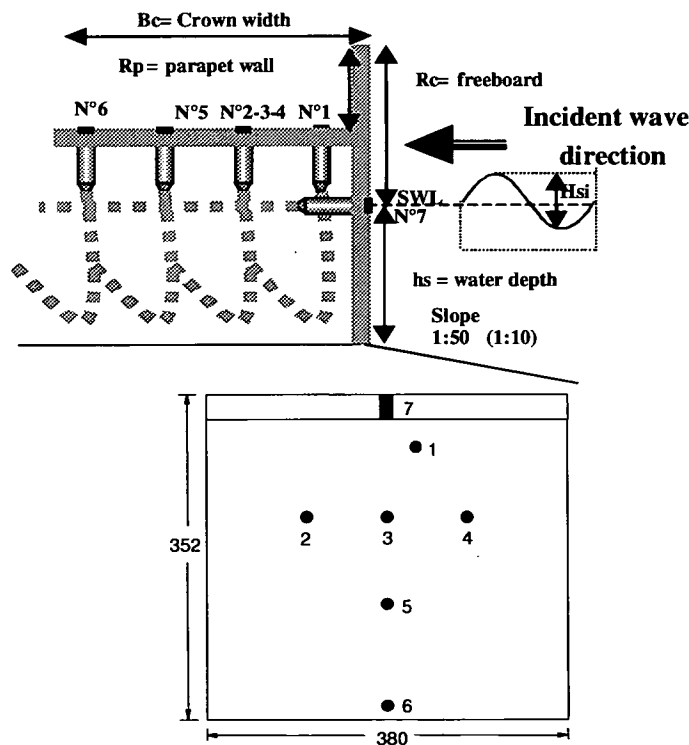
Model seawall and locations of pressure transducers - elevation (upper) and plan view (lower). Dimensions in mm.
